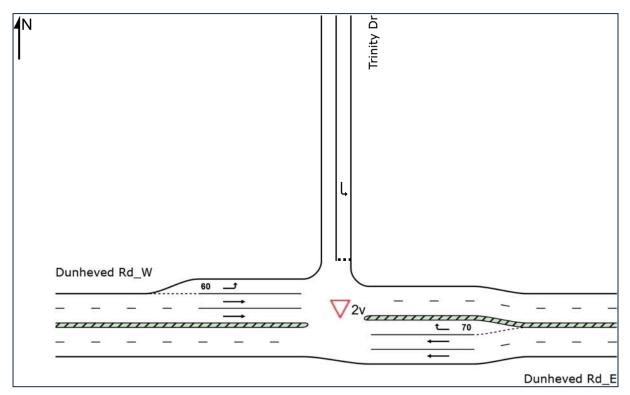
Dunheved Rd / Trinity Dr intersection layout
